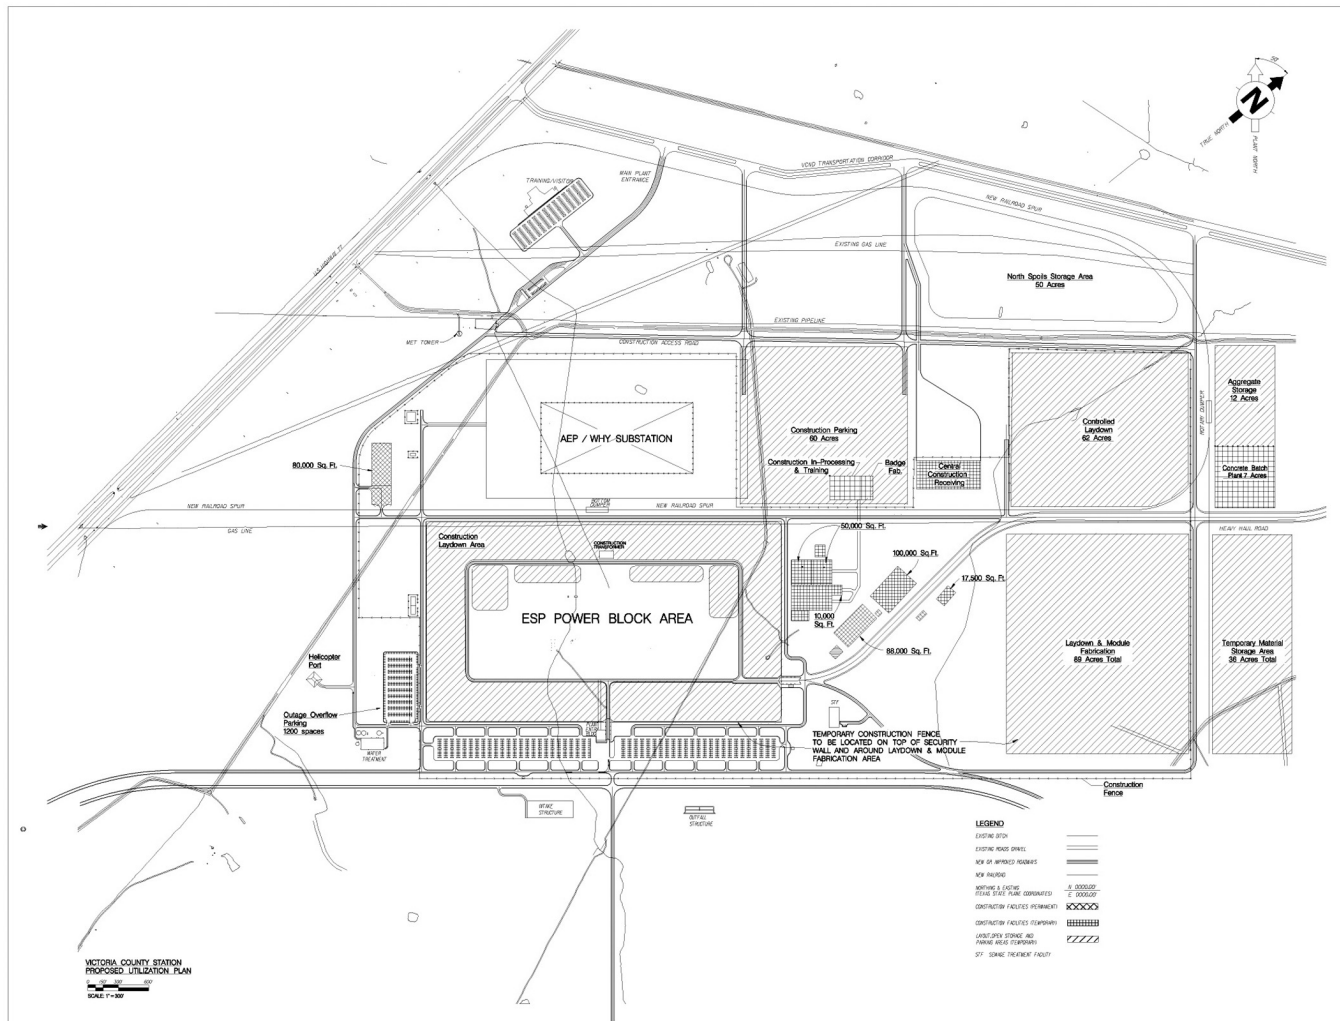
Temporary Facilities During Construction (Typical)
